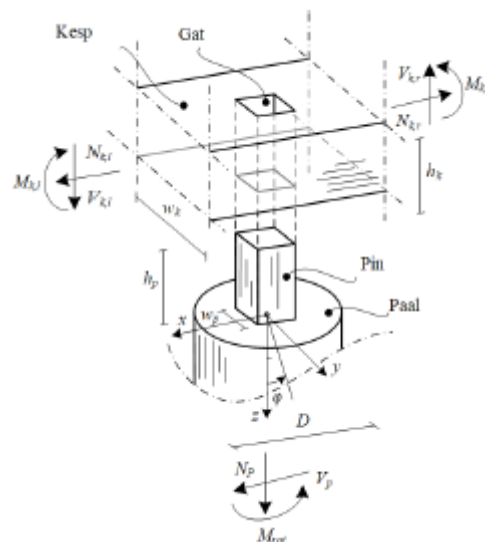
connection between the kespen and pile and all the forces working inside (Hemel, n.d.).
